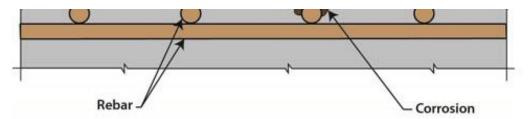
Typical Reinforced Concrete Deck and Slab Deterioration
